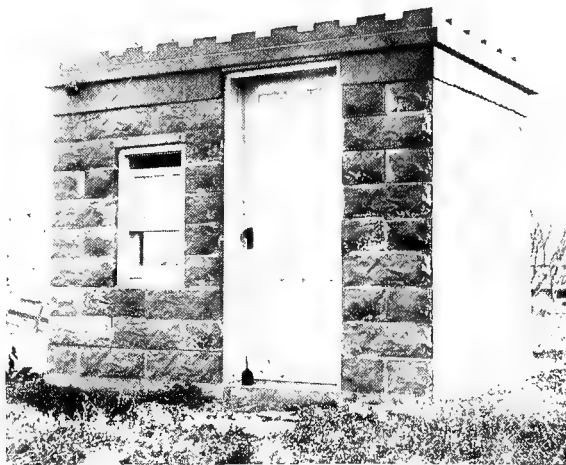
Concrete Block Well House of Mr. M. Sullivan, Marshall, Minnesota. Marshall Tile and Sidewalk Company, builders.
